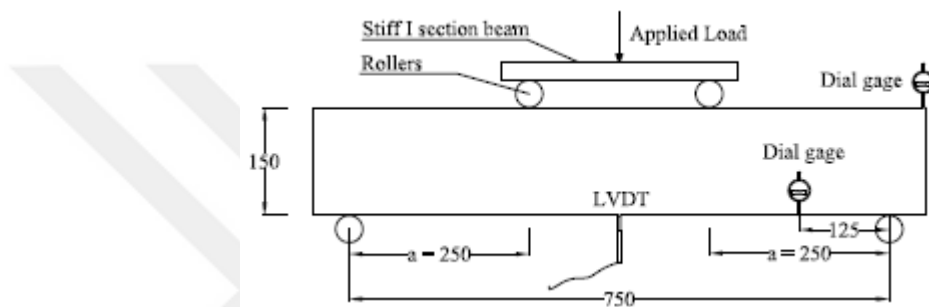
Beams test setup and location of the LVDT and the dial gages
